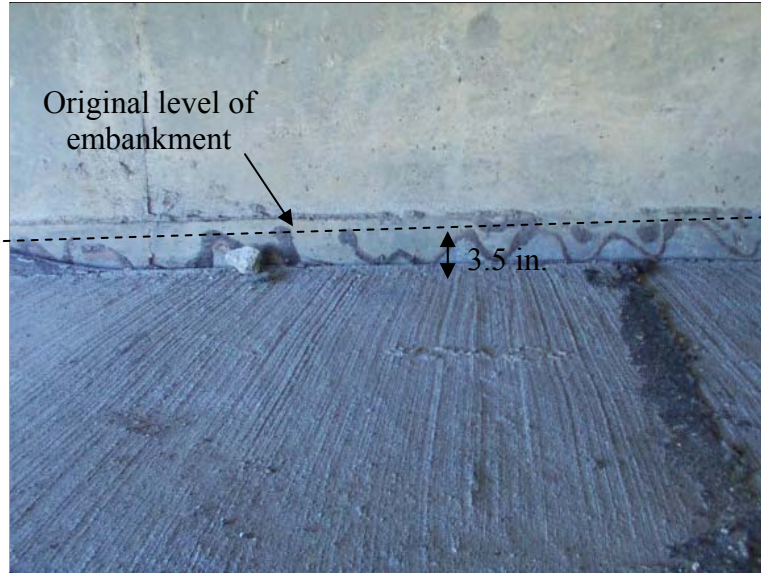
Settlement of the embankment at distance of 3.5 in. (South end of NBL)
